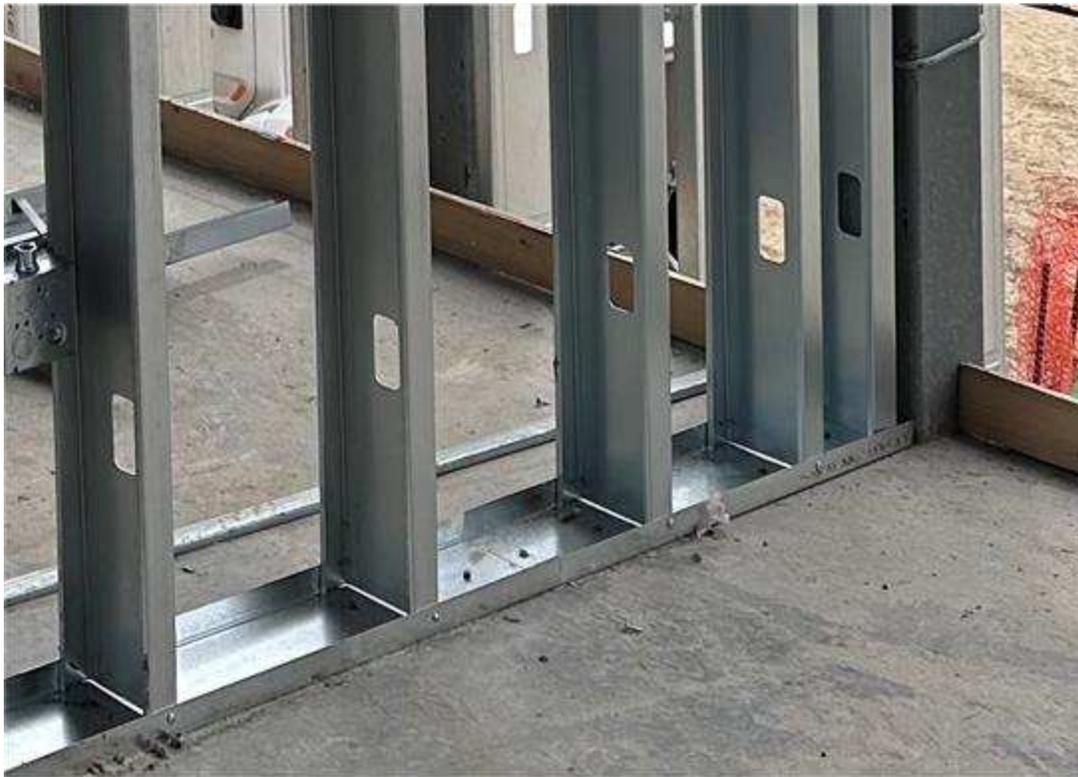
Example of steel stud framing. Vertical studs are attached to the track mounted on the floor.
